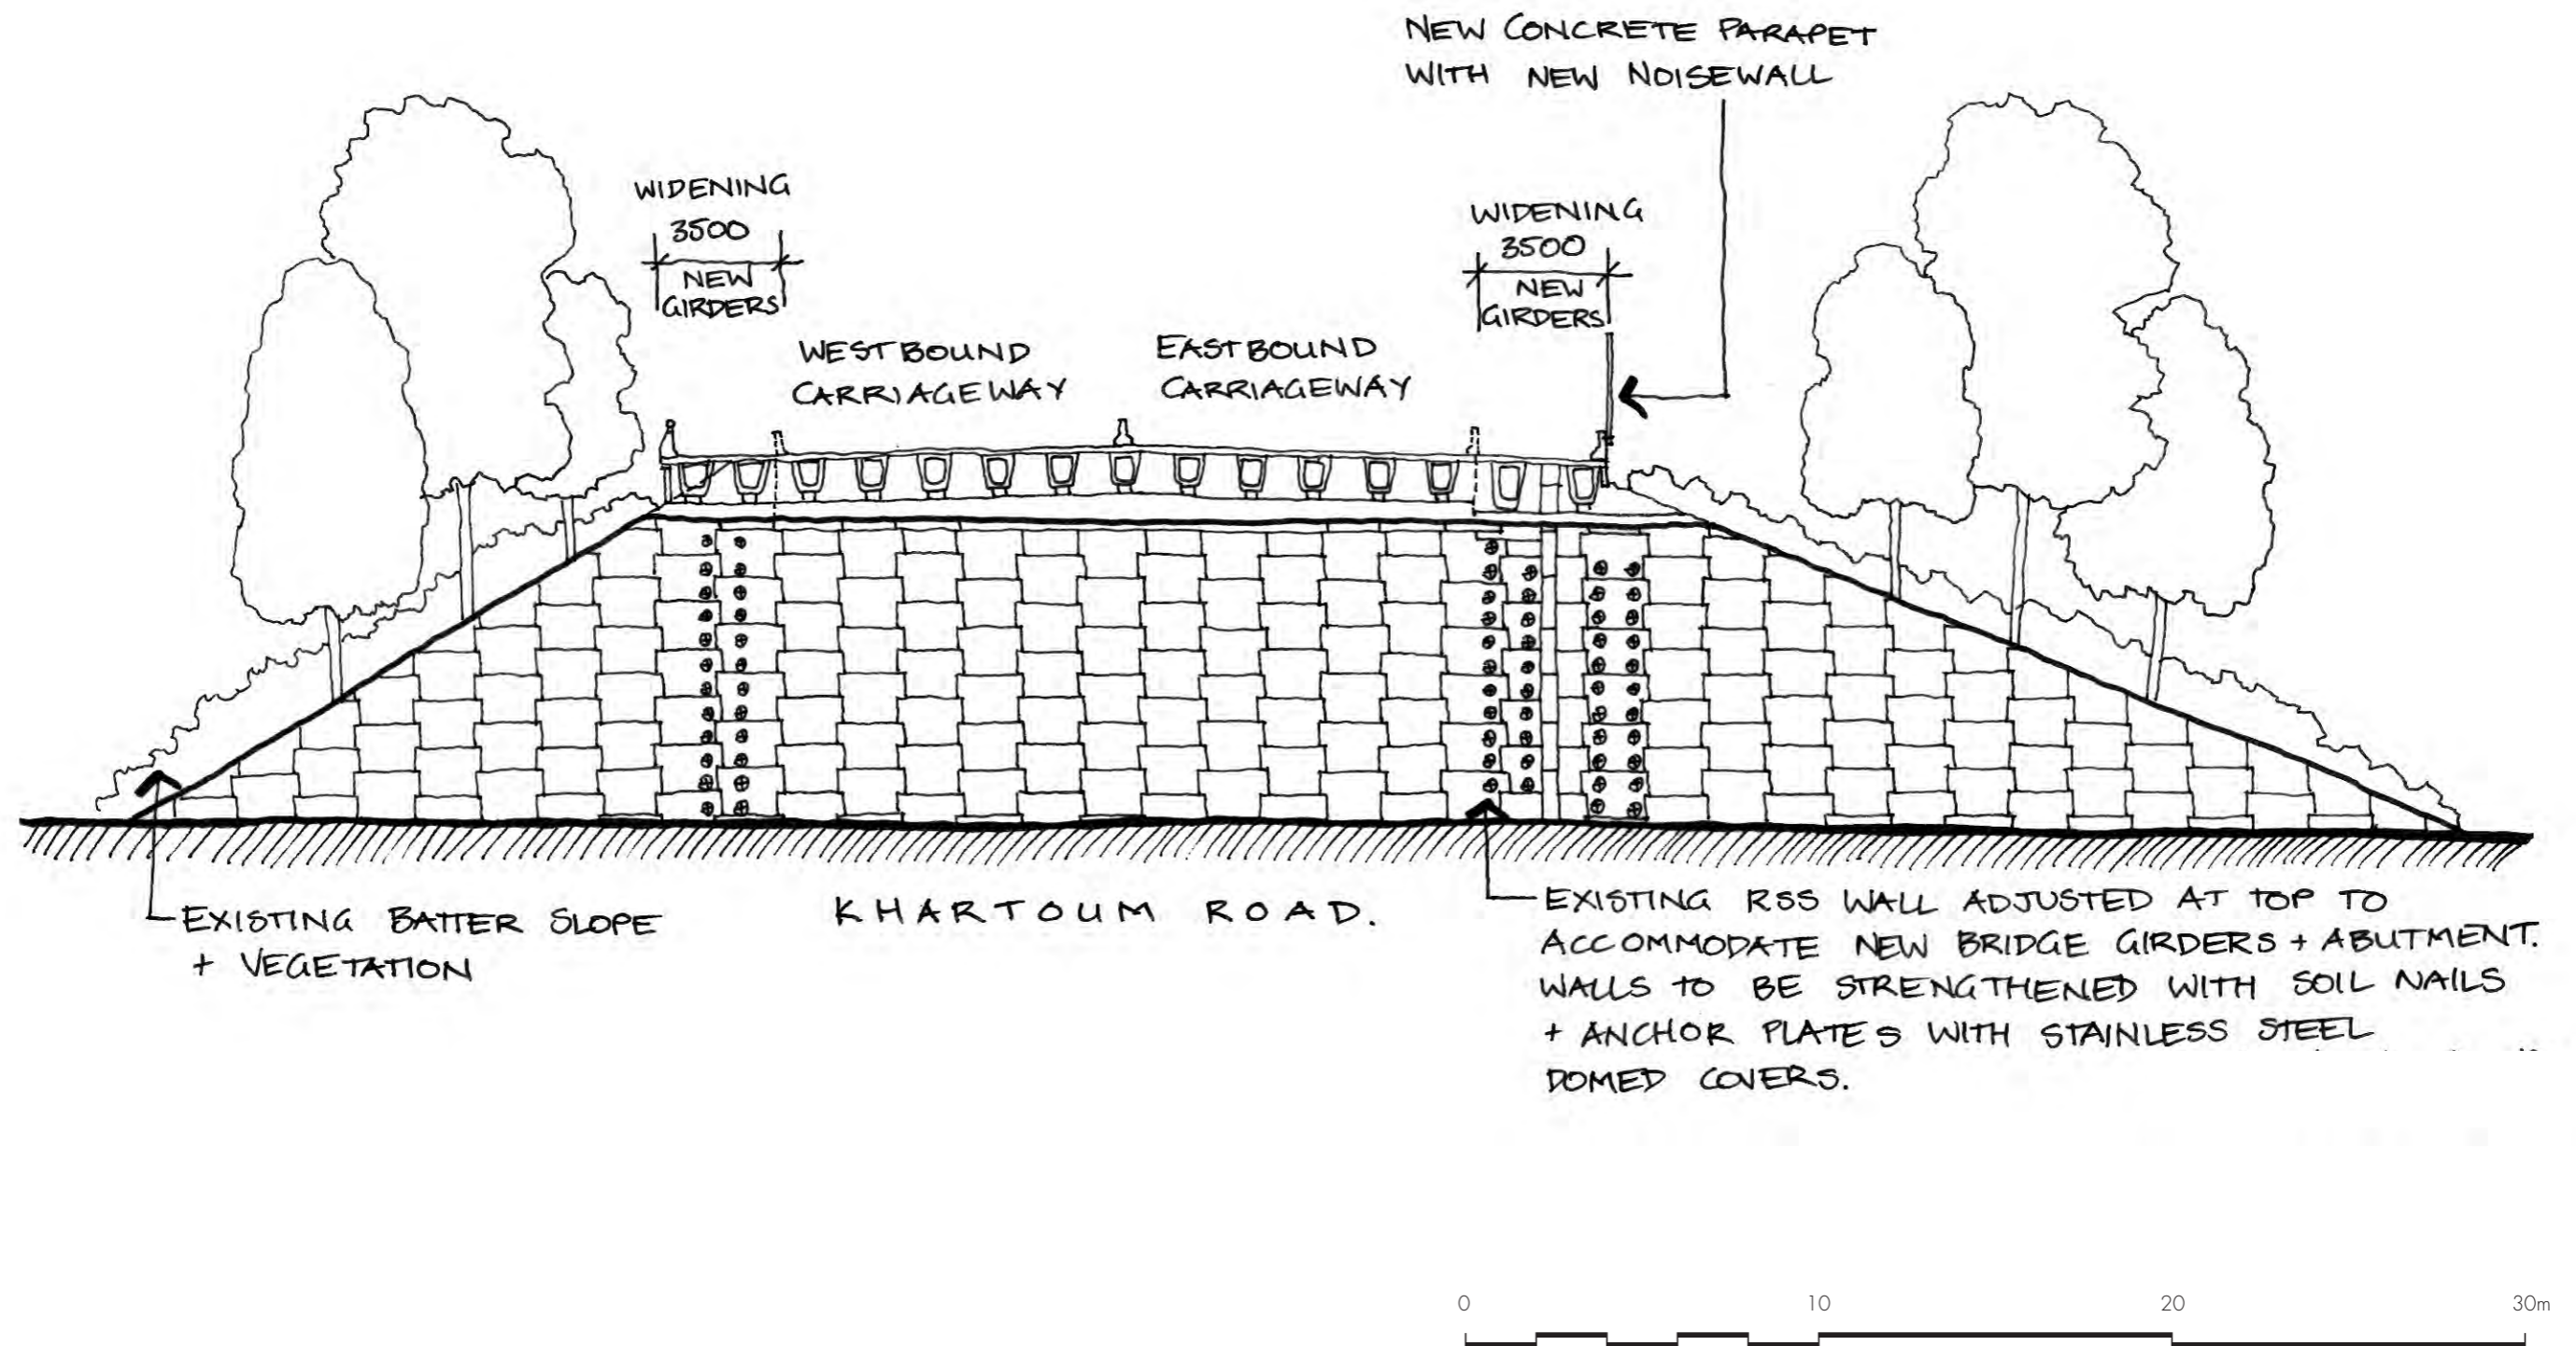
Bridge 6.1 Khartoum Road Bridge - Cross Section
